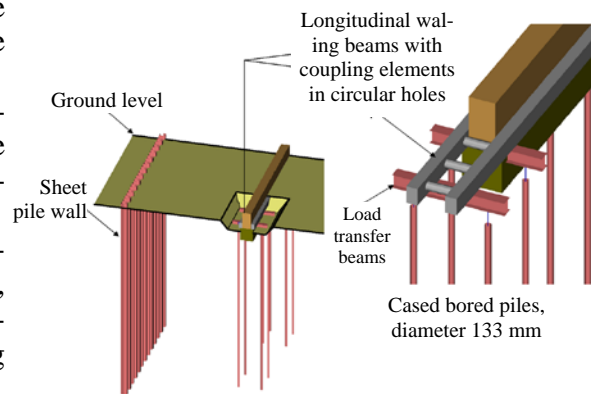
Construction of sheet piles, bored piles, and the unit transferring the load from the walls to the piles.
